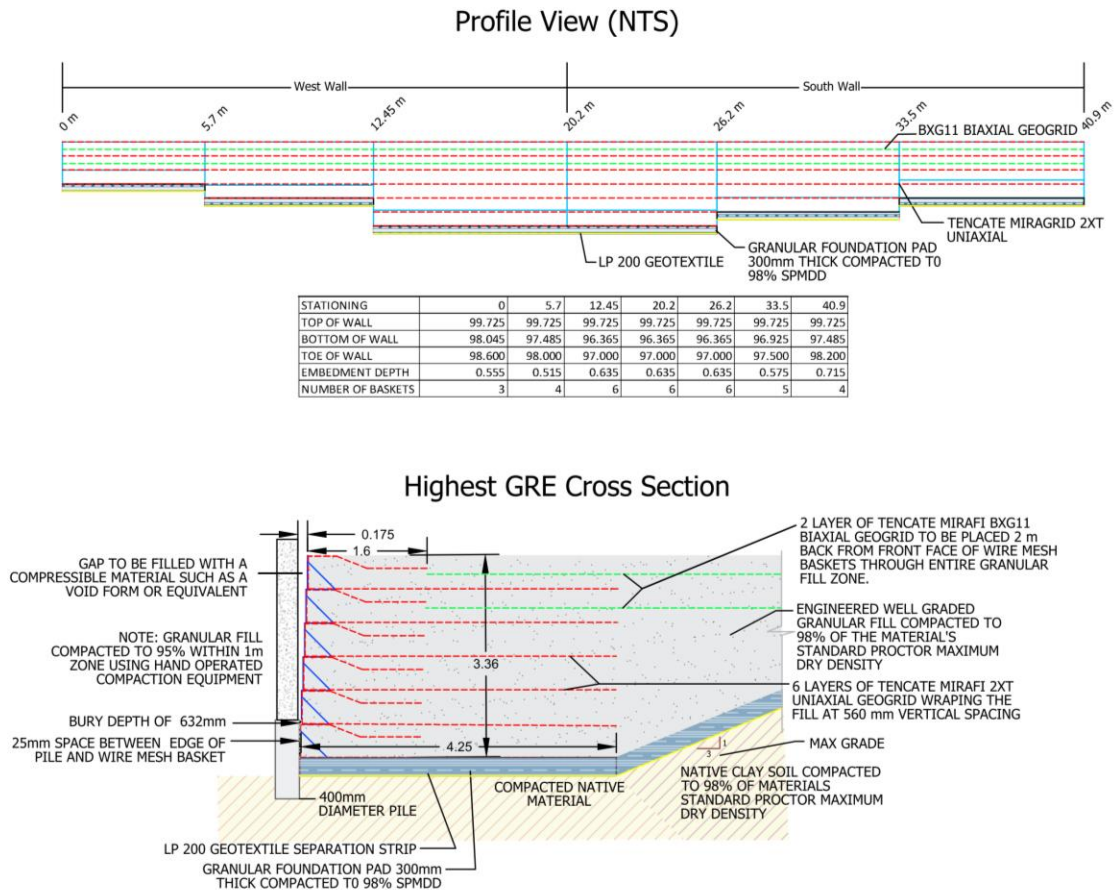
Proposed geosynthetic reinforced earth (GRE) structure design details showing profile and typical cross section
